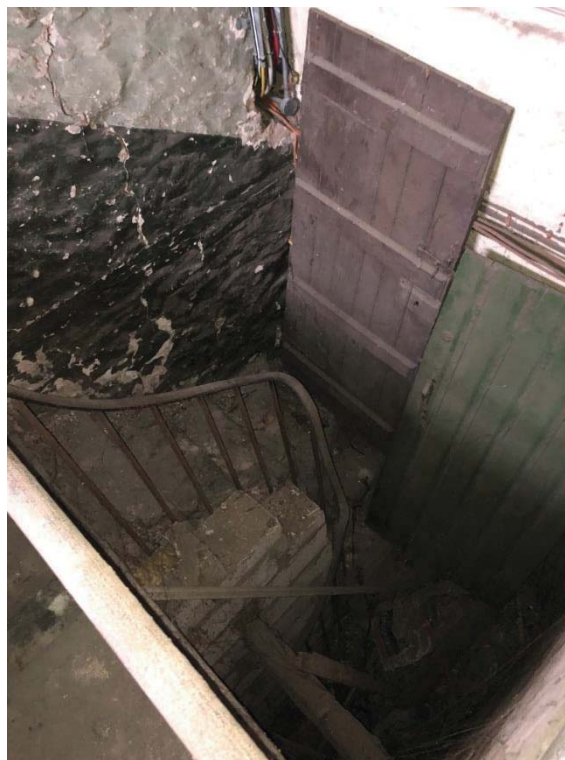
and 32: room at rear of the second floor, showing doorway to front room and entrance into western room
